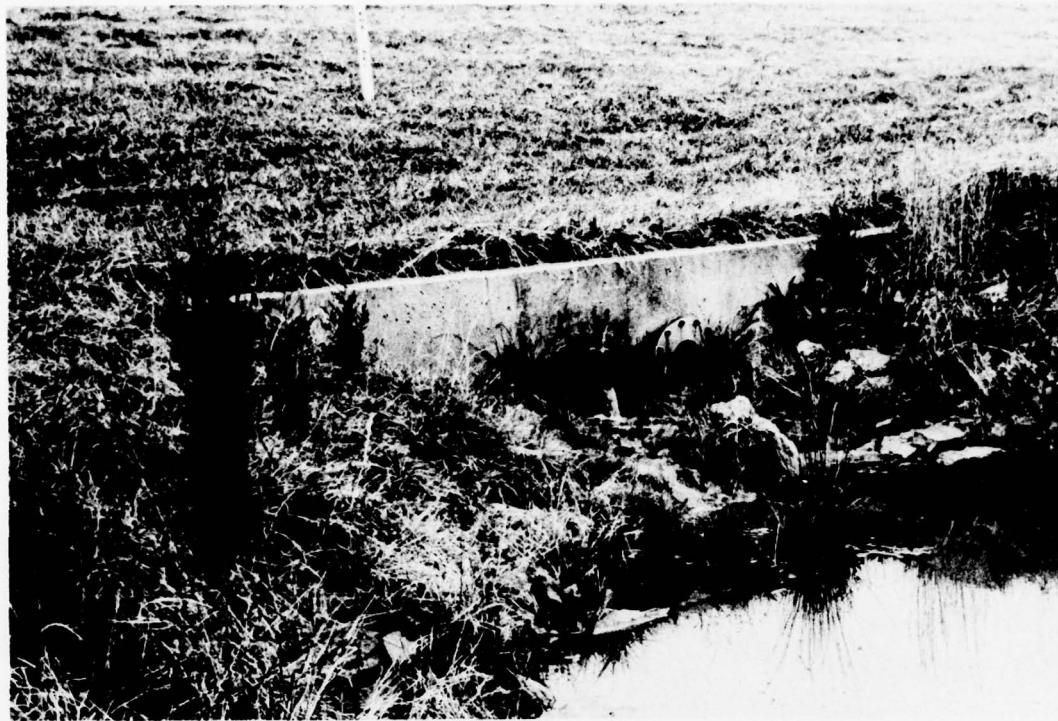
Head Wall Containing Filter Drainpipe (Left Side of Photo) and Reservoir Drainpipe (Right Side of Photo)
